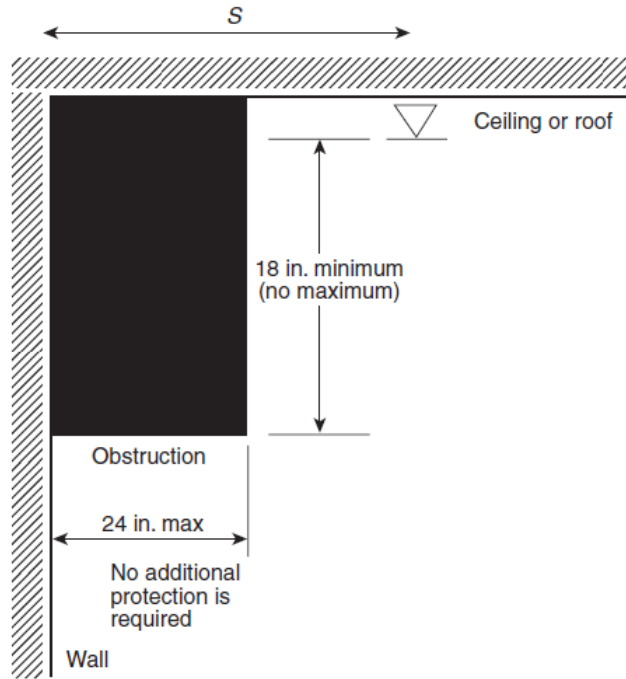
(c) Obstructions Against Walls (SSU/SSP).
